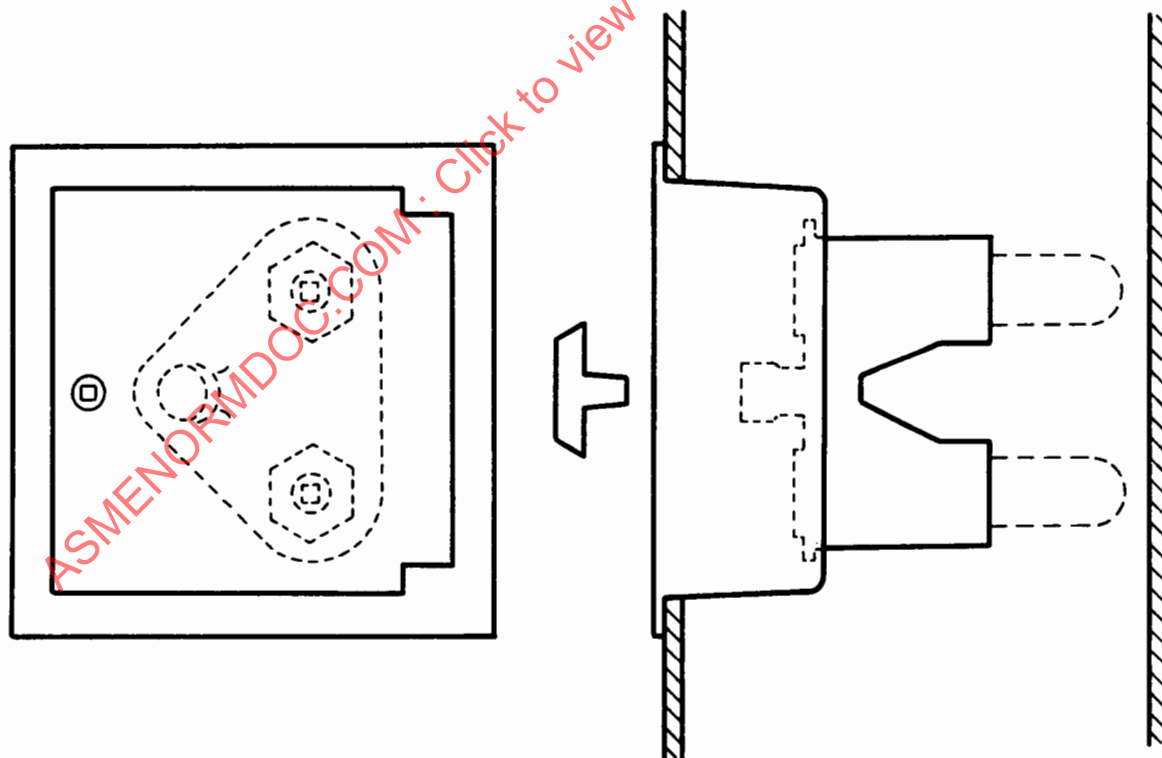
E RECOMMENDED INSTALLATION IN WALLS WHERE THERE IS NO DANGER OF FREEZING
